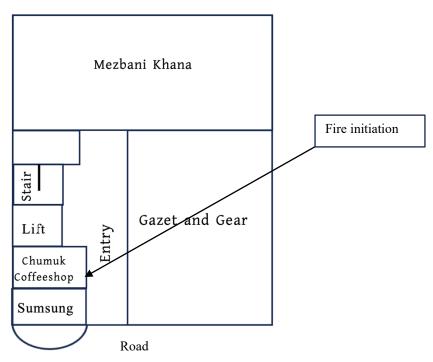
Ground floor layout of Green Cozy Cotez Restaurant
